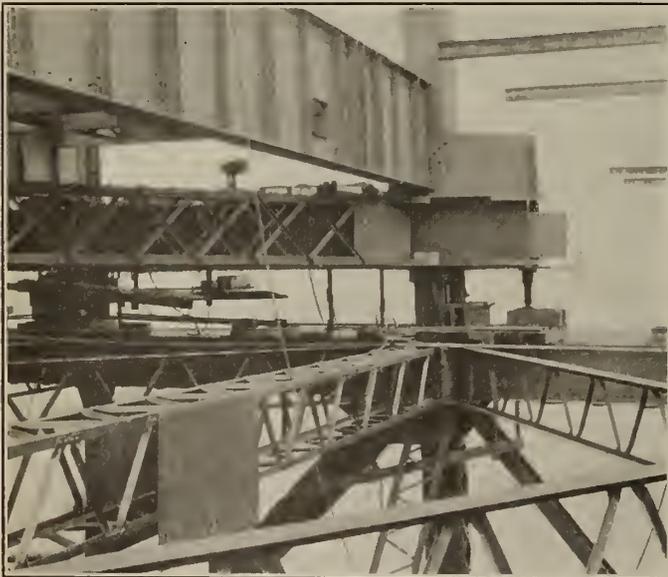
Main Span, South Side—Method of supporting Bottom Chords on Falsework Span.
